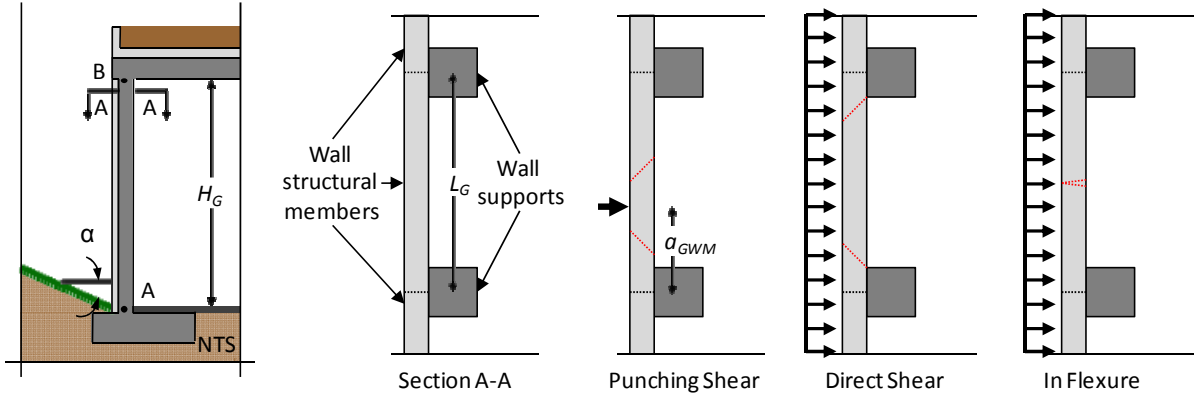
Gallery wall or wall members overloaded in shear or flexure.
